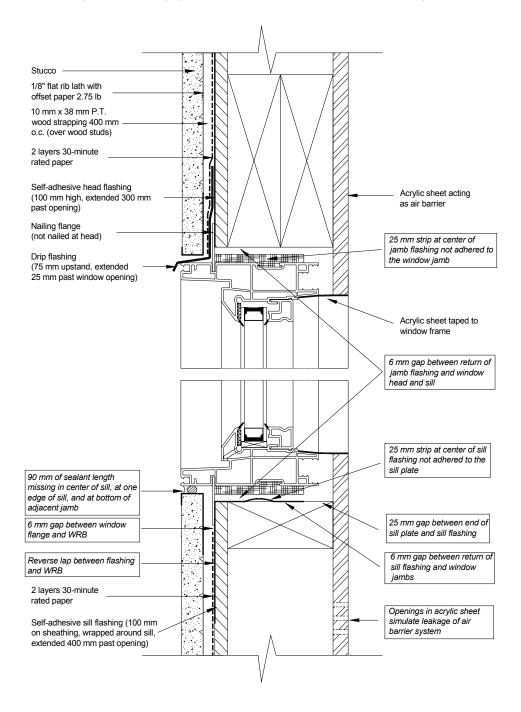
Wall/window detail for specimen No. 5 - vertical section
